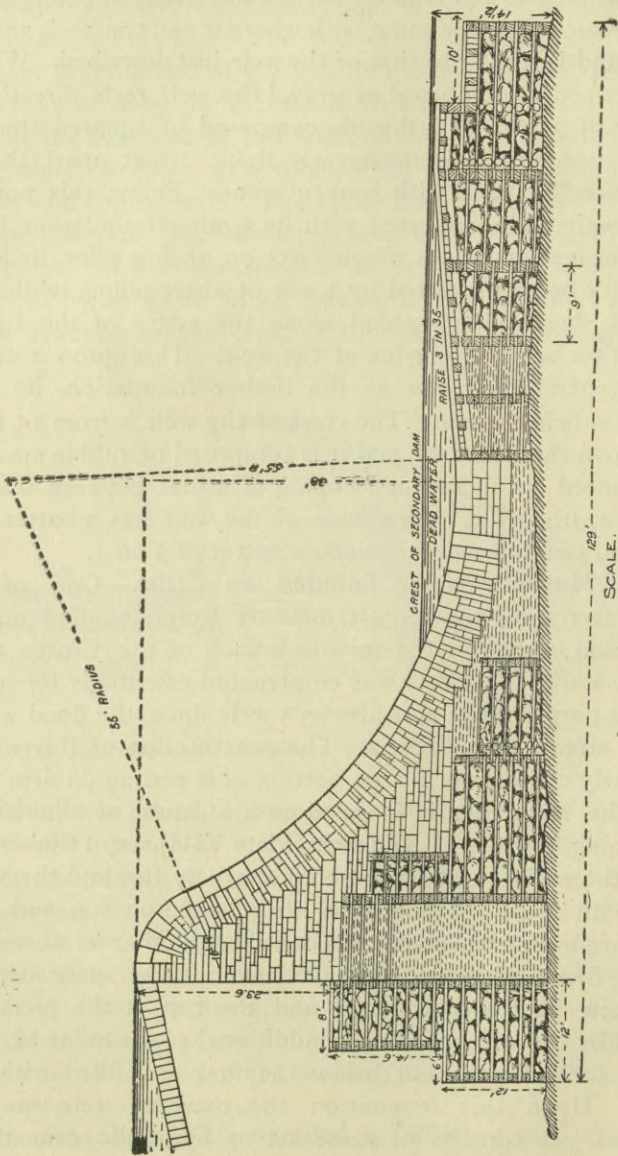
PLATE VIII.—CROSS-SECTION OF CROTON DAM.
